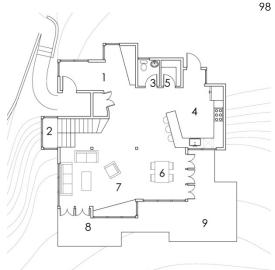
First Floor Plan - 1. Entry 2. Stairs 3. Powder Room 4. Kitchen 5. Pantry 6. Dining 7. Living 8. Deck 9. Outdoor Dining
